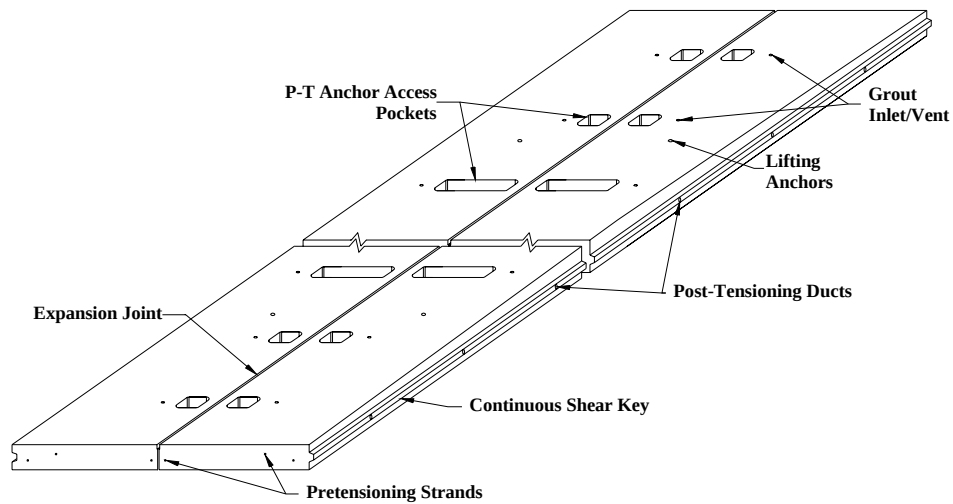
Diagram of a typical Joint Panel showing the dowelled expansion joint and post-tensioning anchor access pockets.
